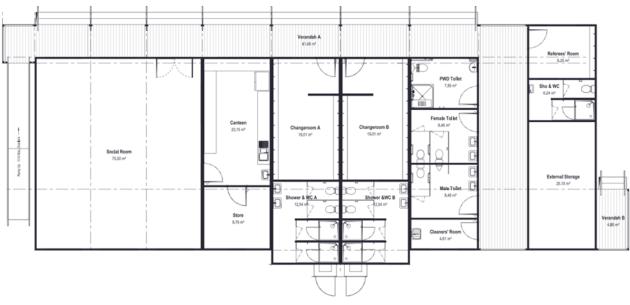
A floorplan of a pavilion (Sourced: Ausco 2022)
